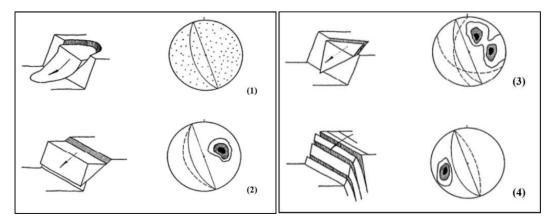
Kinematic conditions of slope failure based on fracture plane (left: failure type; right: stereographic projection; (1) Rotational failure, (2) Planar failure, (3) Wedge failure, (4) Toppling failure [4]
